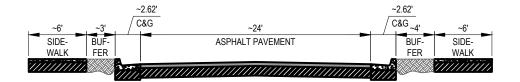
EXISTING 8TH STREET TYPICAL SECTION
